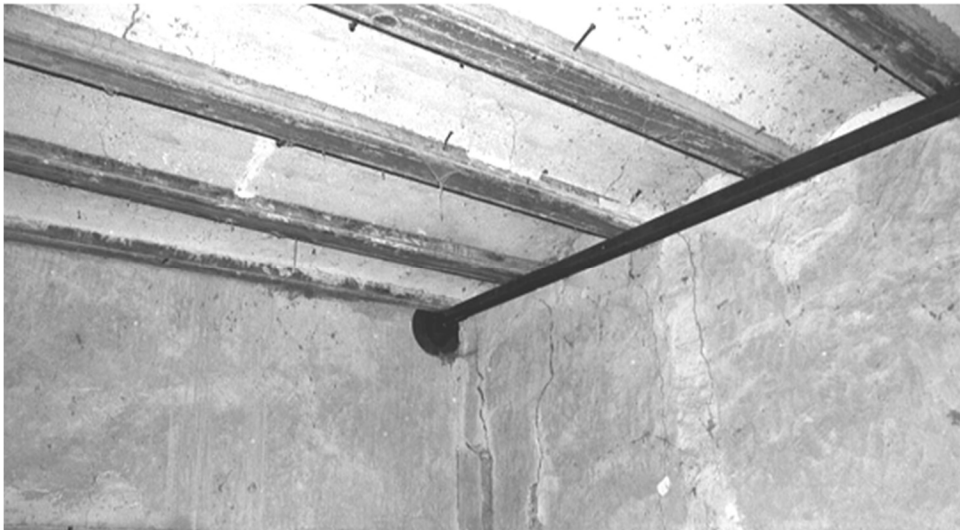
Strengthening of opposing walls tie bars (Jaquin 2008).
